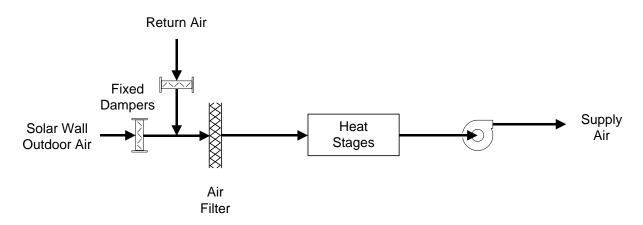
HVAC system diagram for the Breck School solar wall installation.
